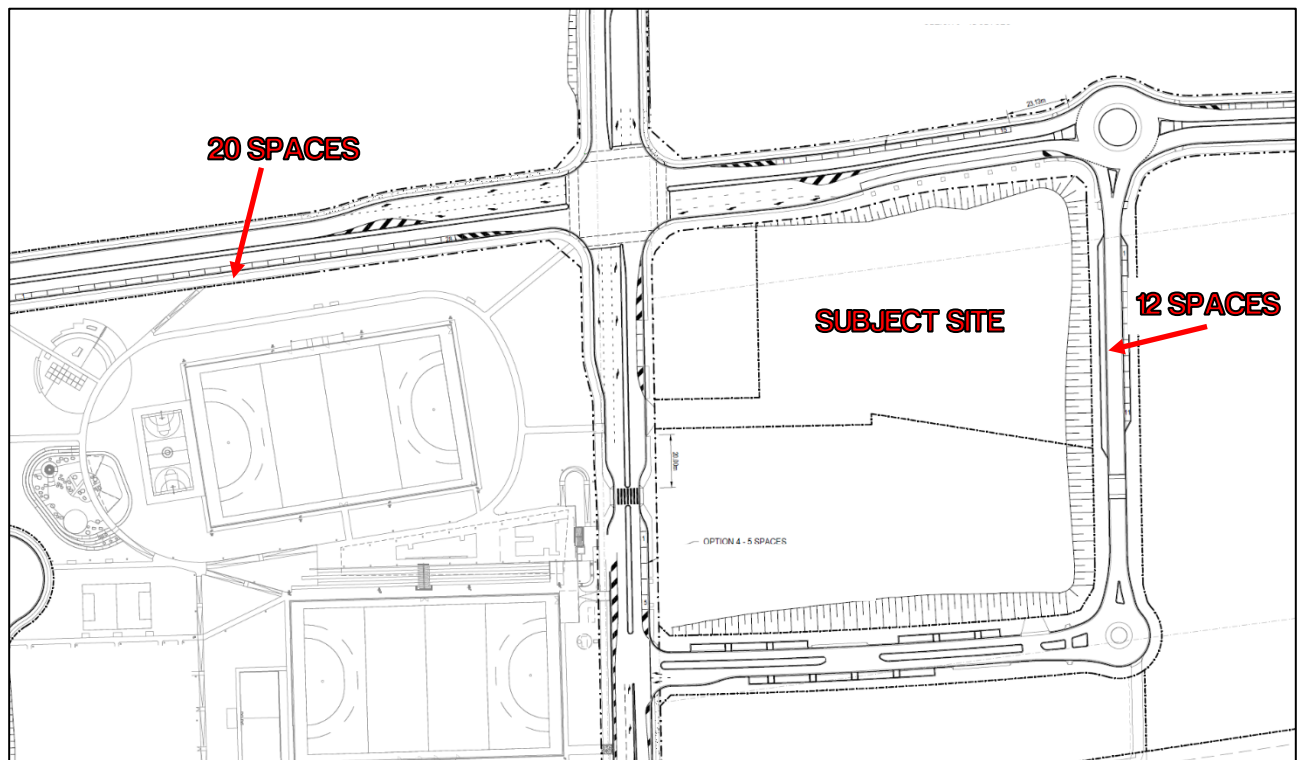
Proposed Pick-Up / Drop-Off Facilities
